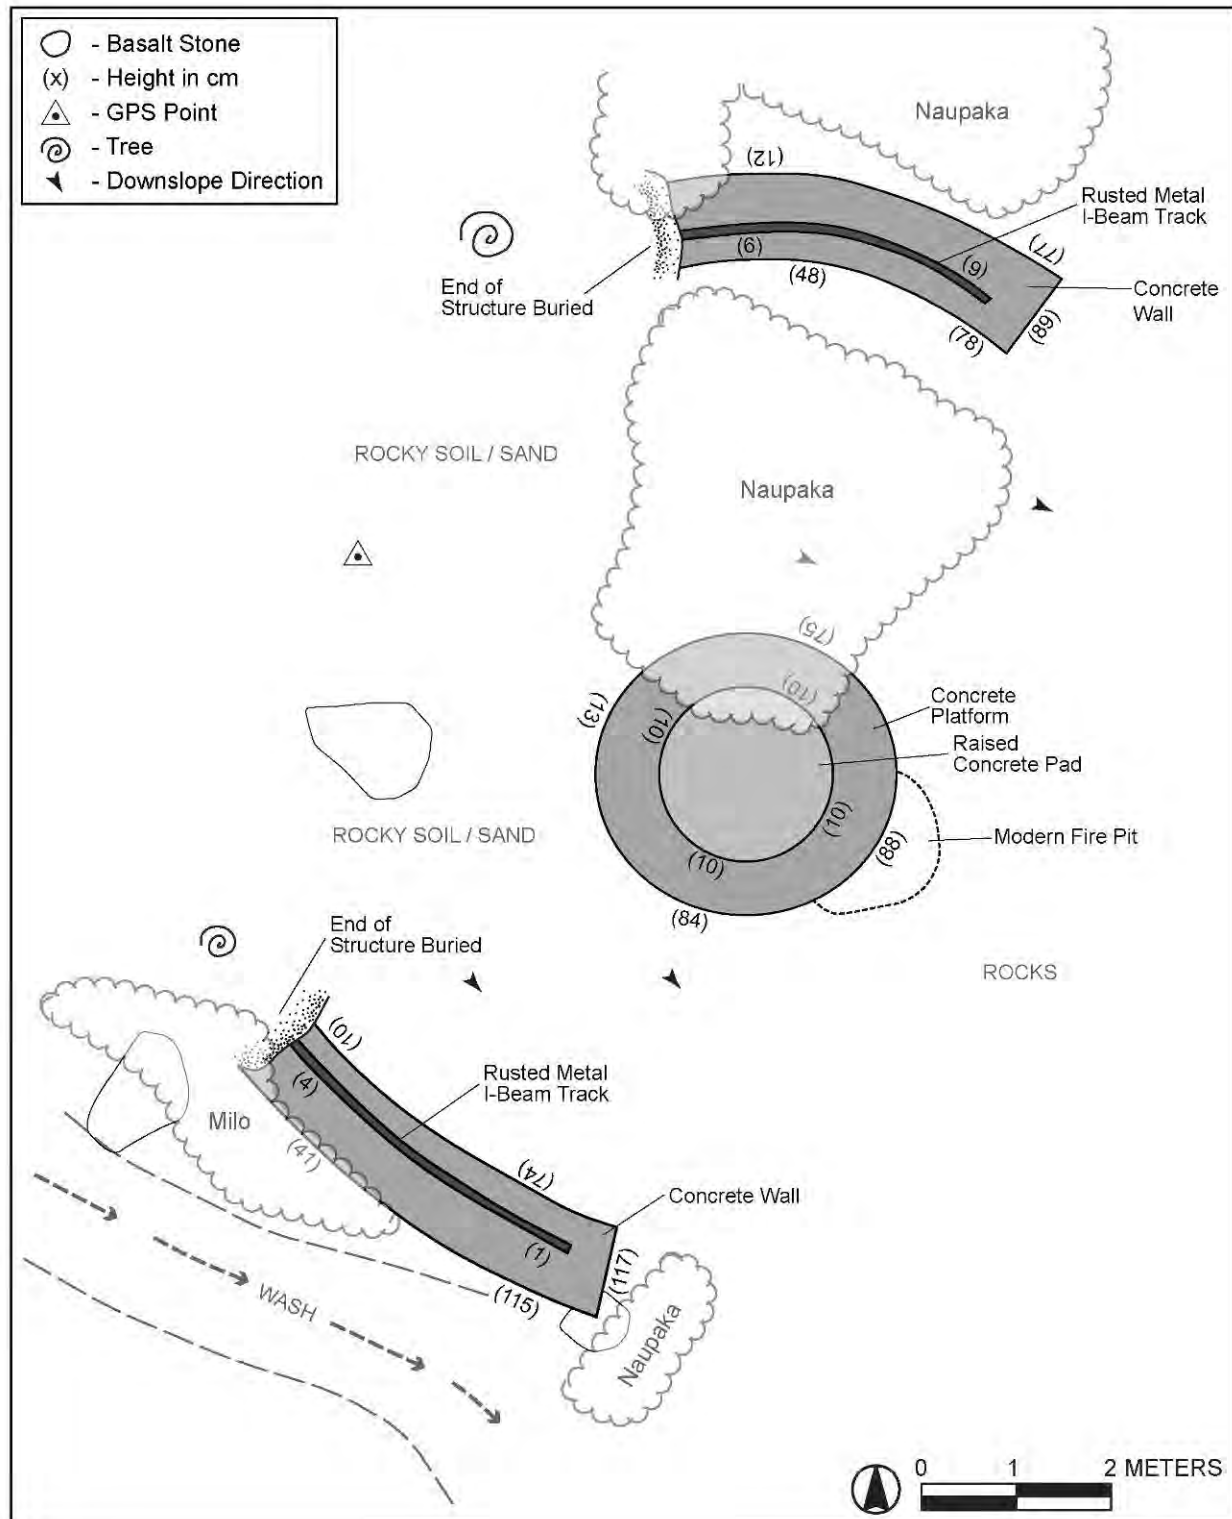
Plan view of SIHP # 50-30-11-2090 (CSH 8)
